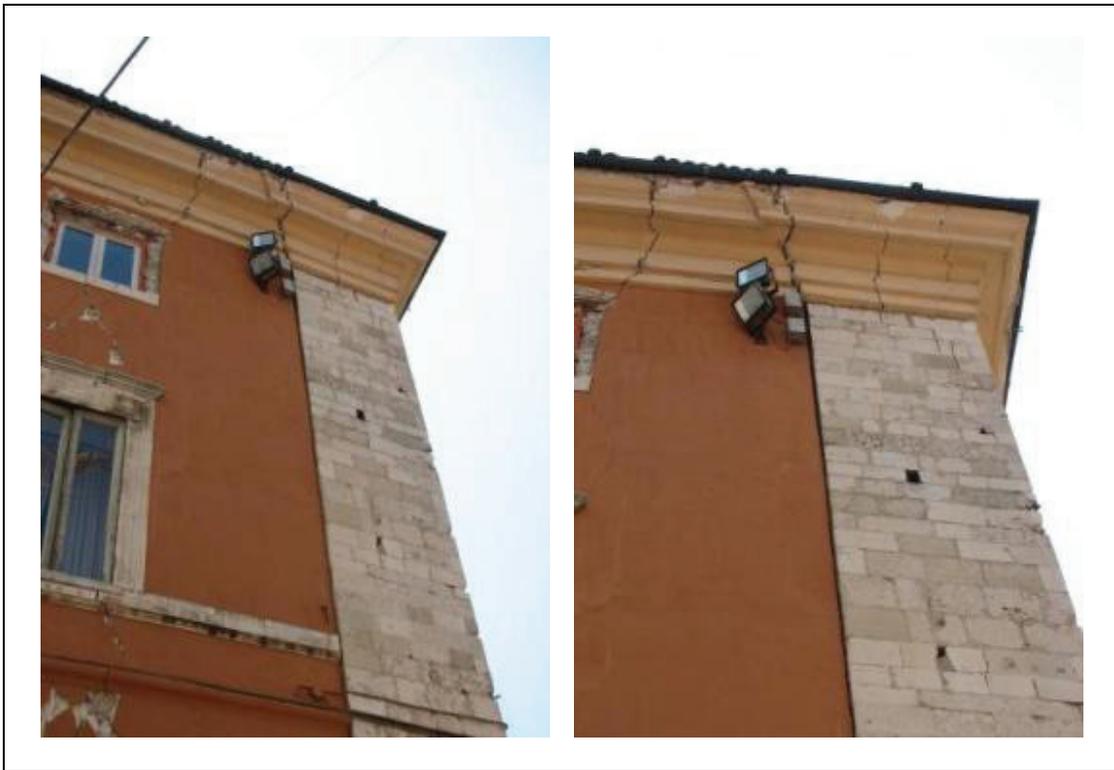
Vertical cracks on the West side of Piazza Margherita
